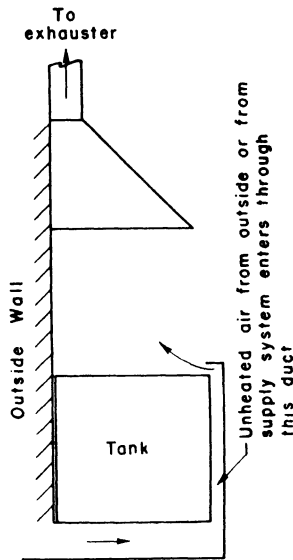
Supply and Exhaust System of Tank Ventilation
